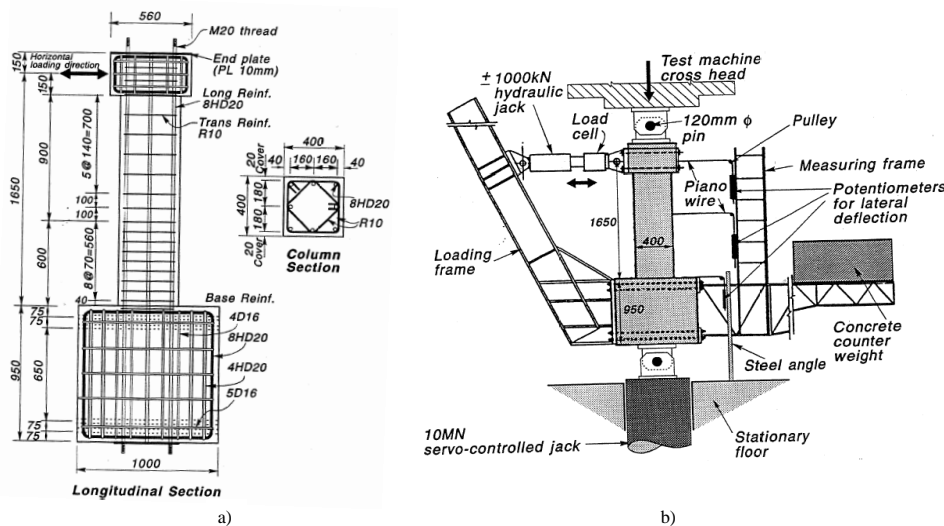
Experimental study by Li [5]: a) specimen details (units 1,2 and 3); b) test setup
